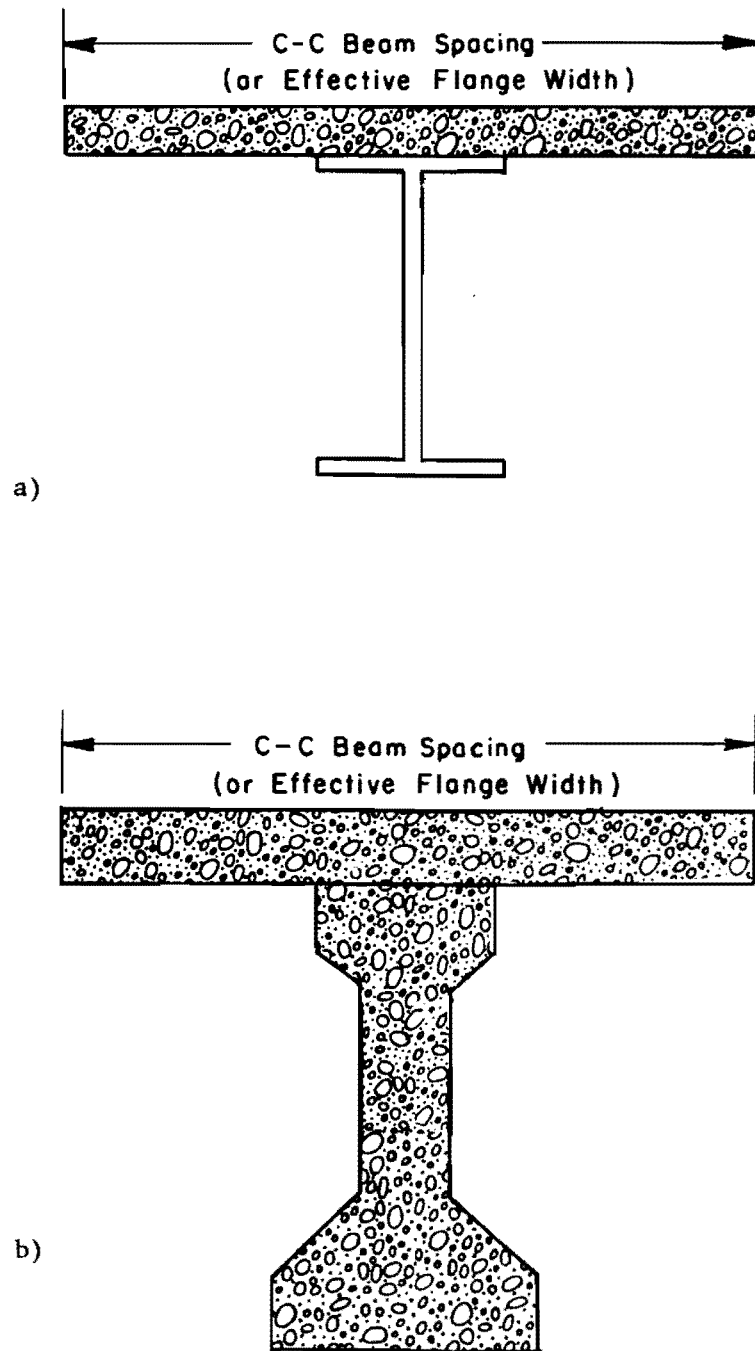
Typical main members of a) steel beam and slab section (class 1) and b) prestressed girder and slab section (class 2).
